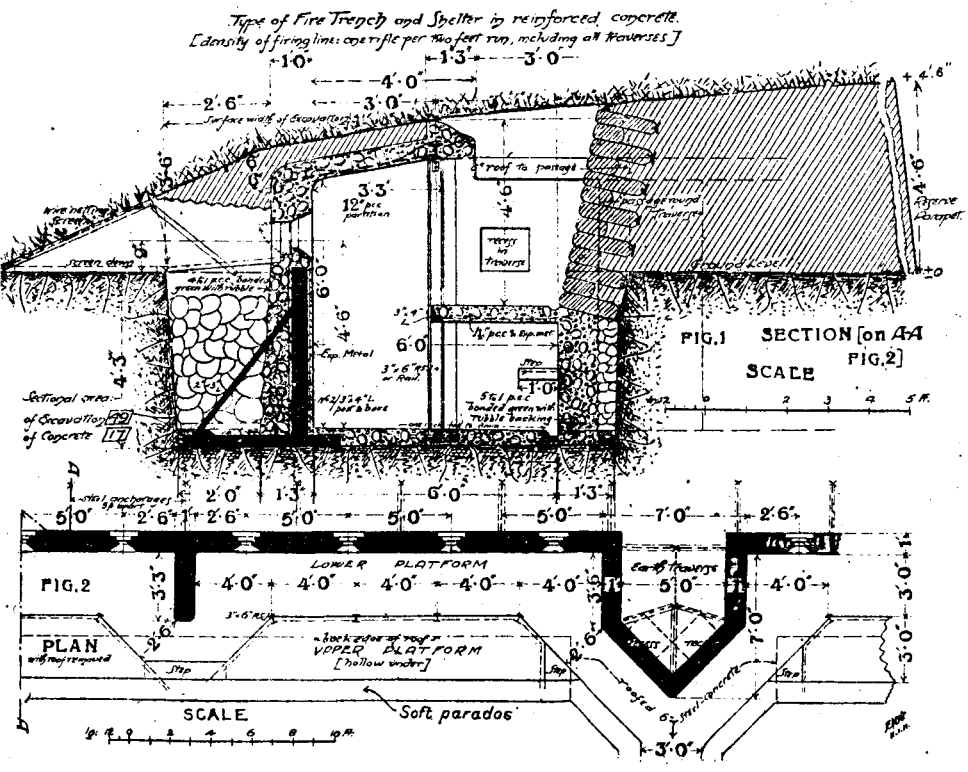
Fire Trench with Splinter-Proof Shelters under the Parapet (German).
